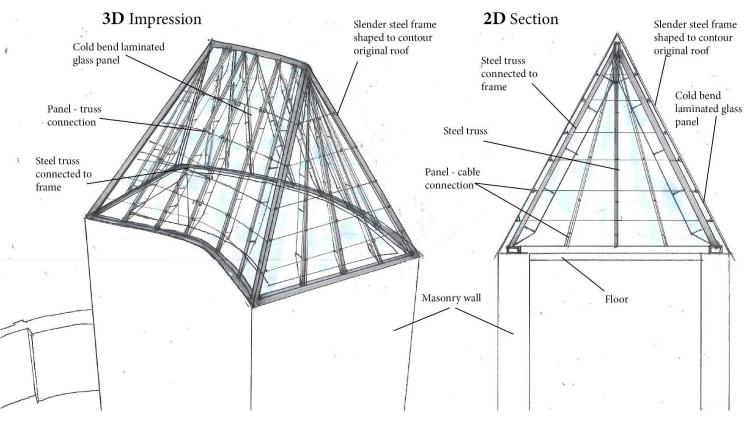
Conceptual design proposal of an steel truss glass structure. Source: own ill.
